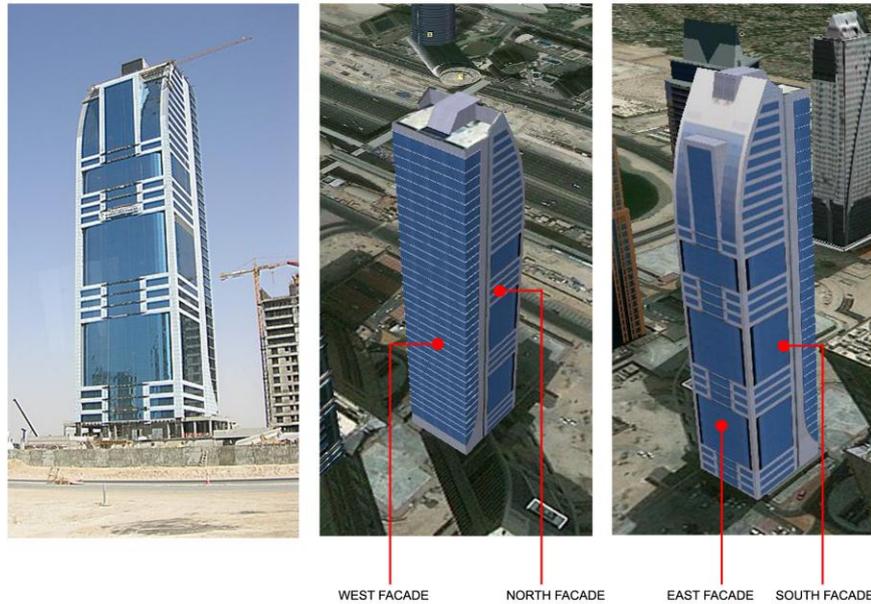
The Saba tower building façade. ([www.googleearth.com](http://www.googleearth.com)).
